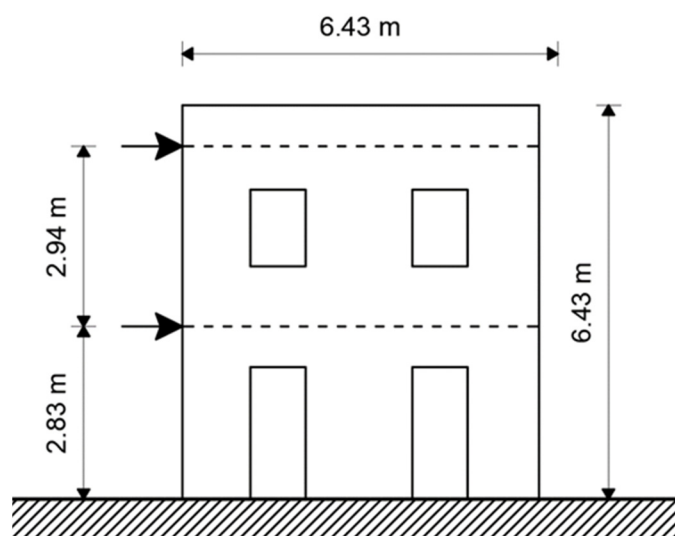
Geometric scheme of the “Door Wall” in Pavia.
